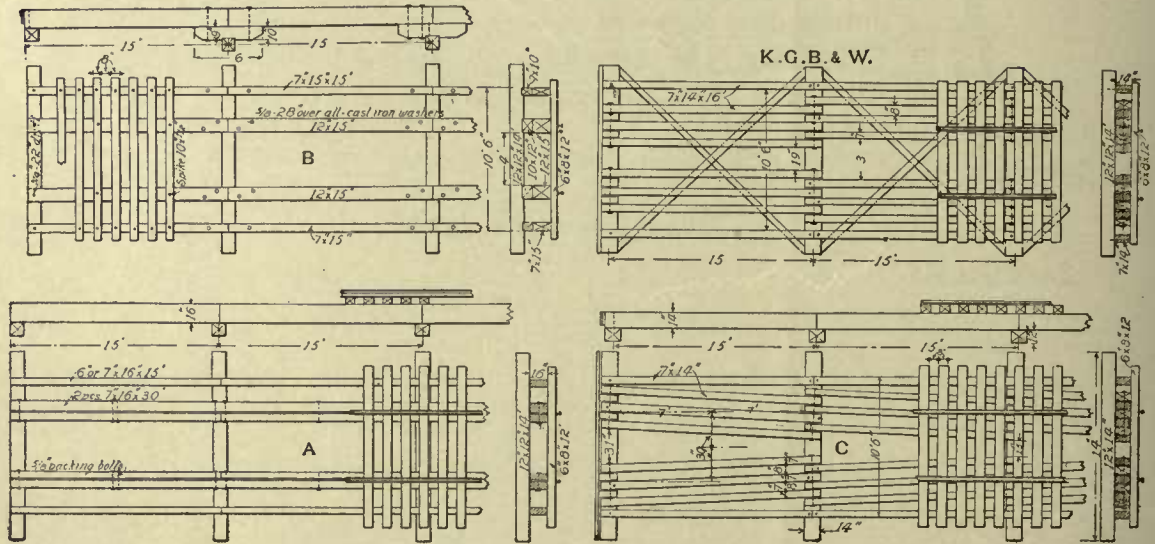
FLOOR-SYSTEMS OF TRESTLE-BRIDGES.
